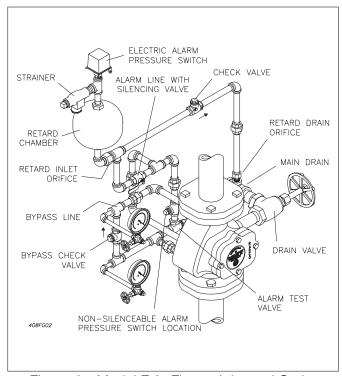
Model E 3" Flange Inlet and Outlet Alarm Valve—Variable Pressure Closed Drain Trim
